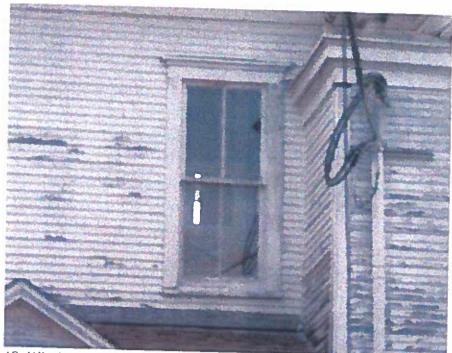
Window to the 2nd floor east bathroom. Glass broken, window currently not operable.
